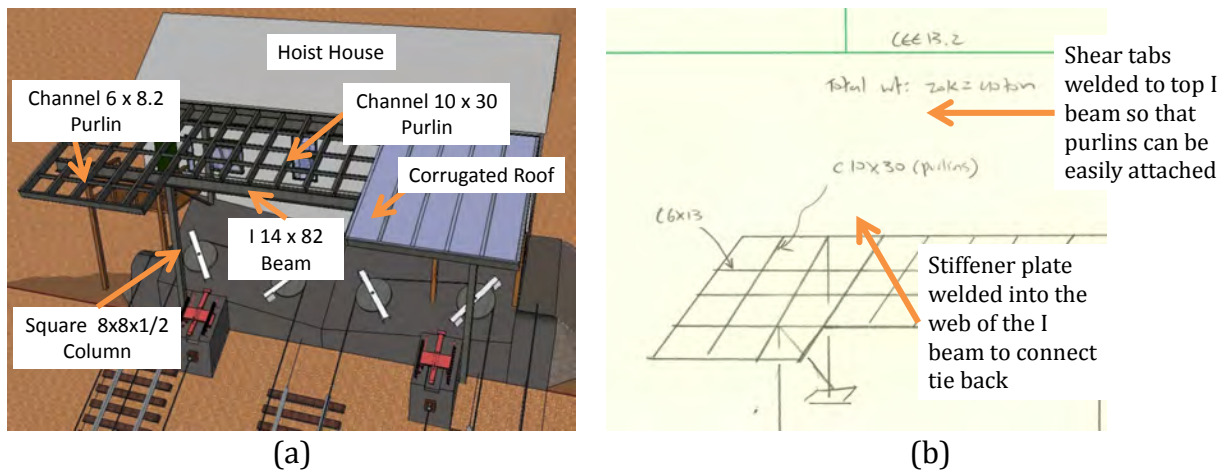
Option 3: (a) Steel Roof Design to Cover Exposed Concrete (Corrugated Roof Only Shown on Right so that Structural Components Below Visible) and (b) Schematic of Beam-Column Connection Design
